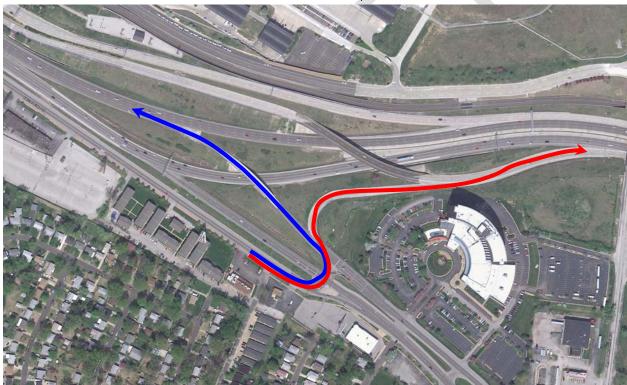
RAMP CONFIGURATION AT NATURAL BRIDGE ROAD AND I-70, EAST OF WOODSON TERRACE
